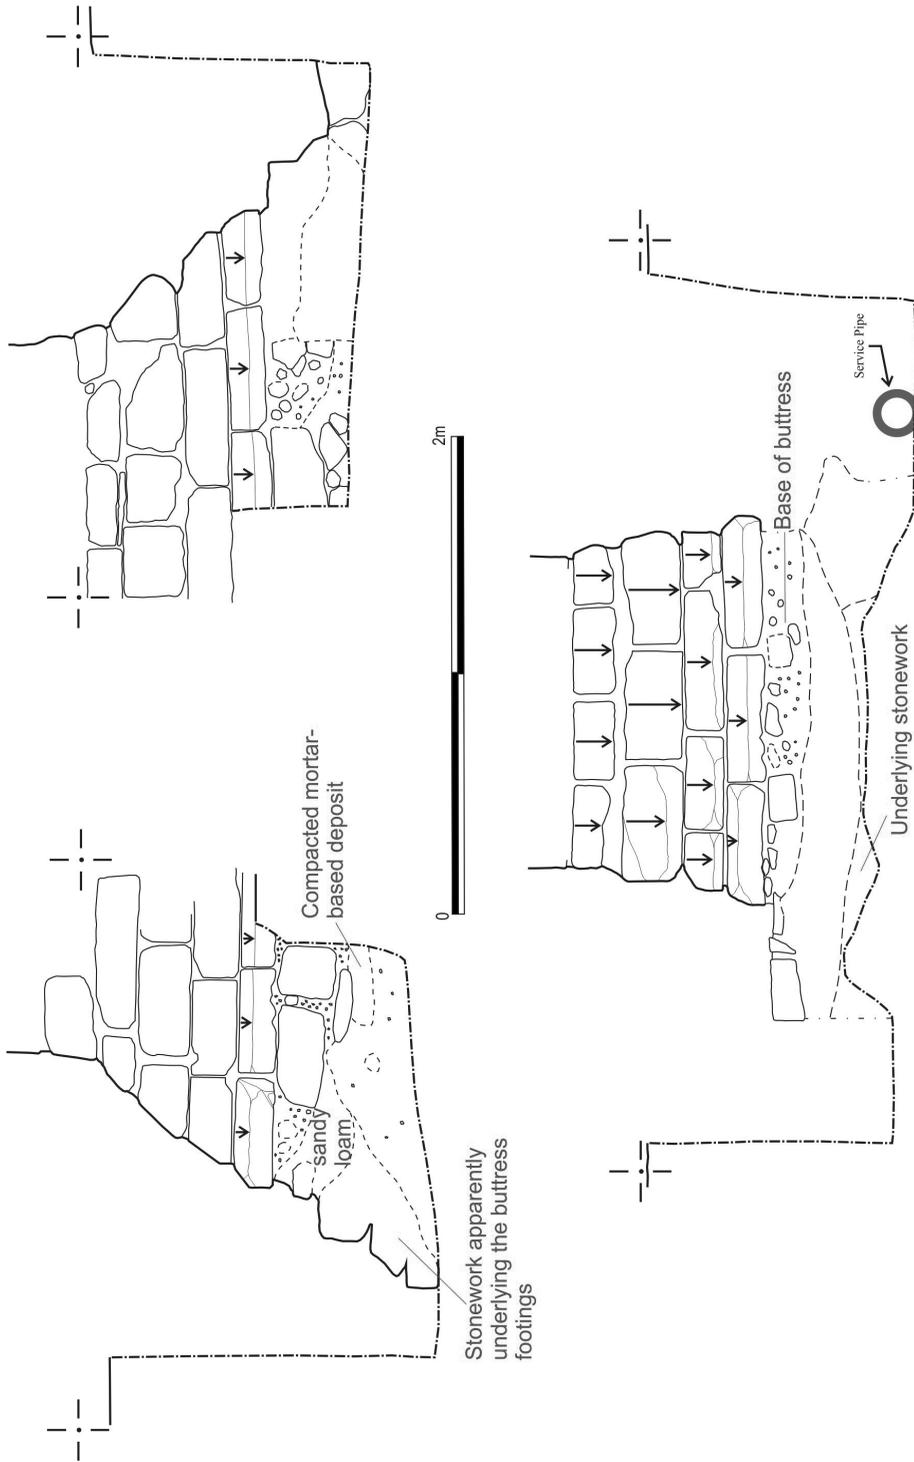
Plan of excavations carried out against the original buttresses in Trenches 4 and 5.
